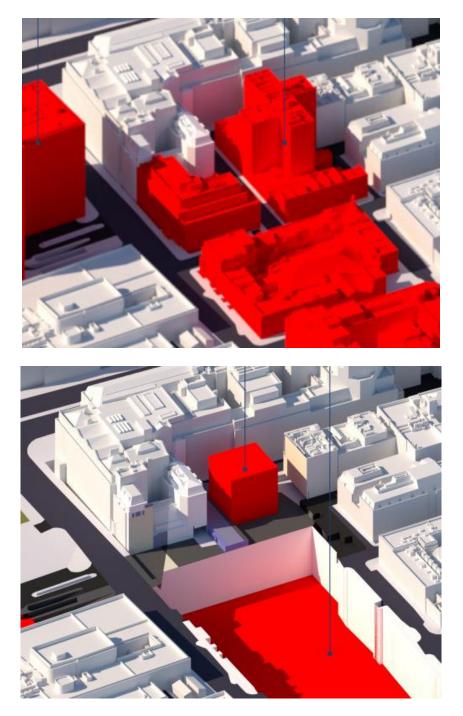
Existing (above) and Proposed (below) context surrounding the vent shaft and substation building, shown to the centre.
